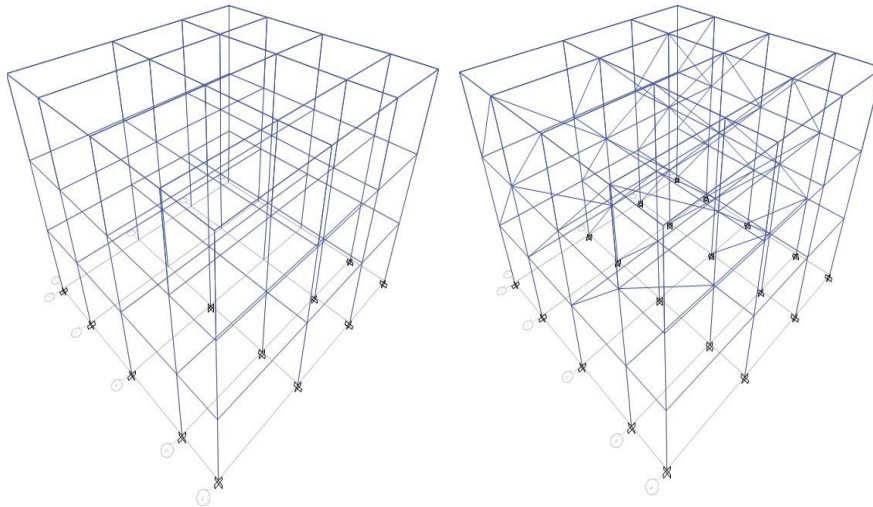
Bare frame & Soft Storey 3D view with strutsBuilding 1
